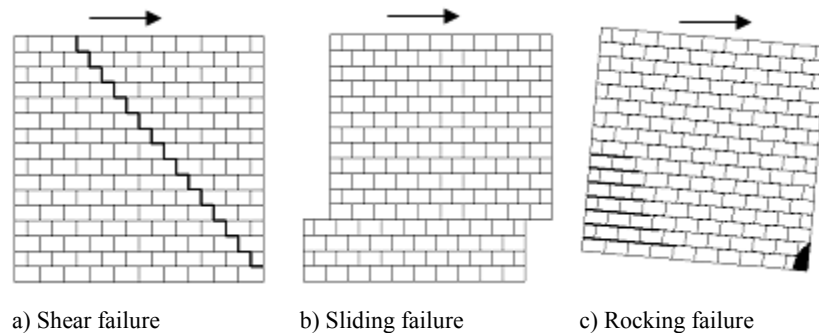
In-plane failure mechanisms of masonry walls
